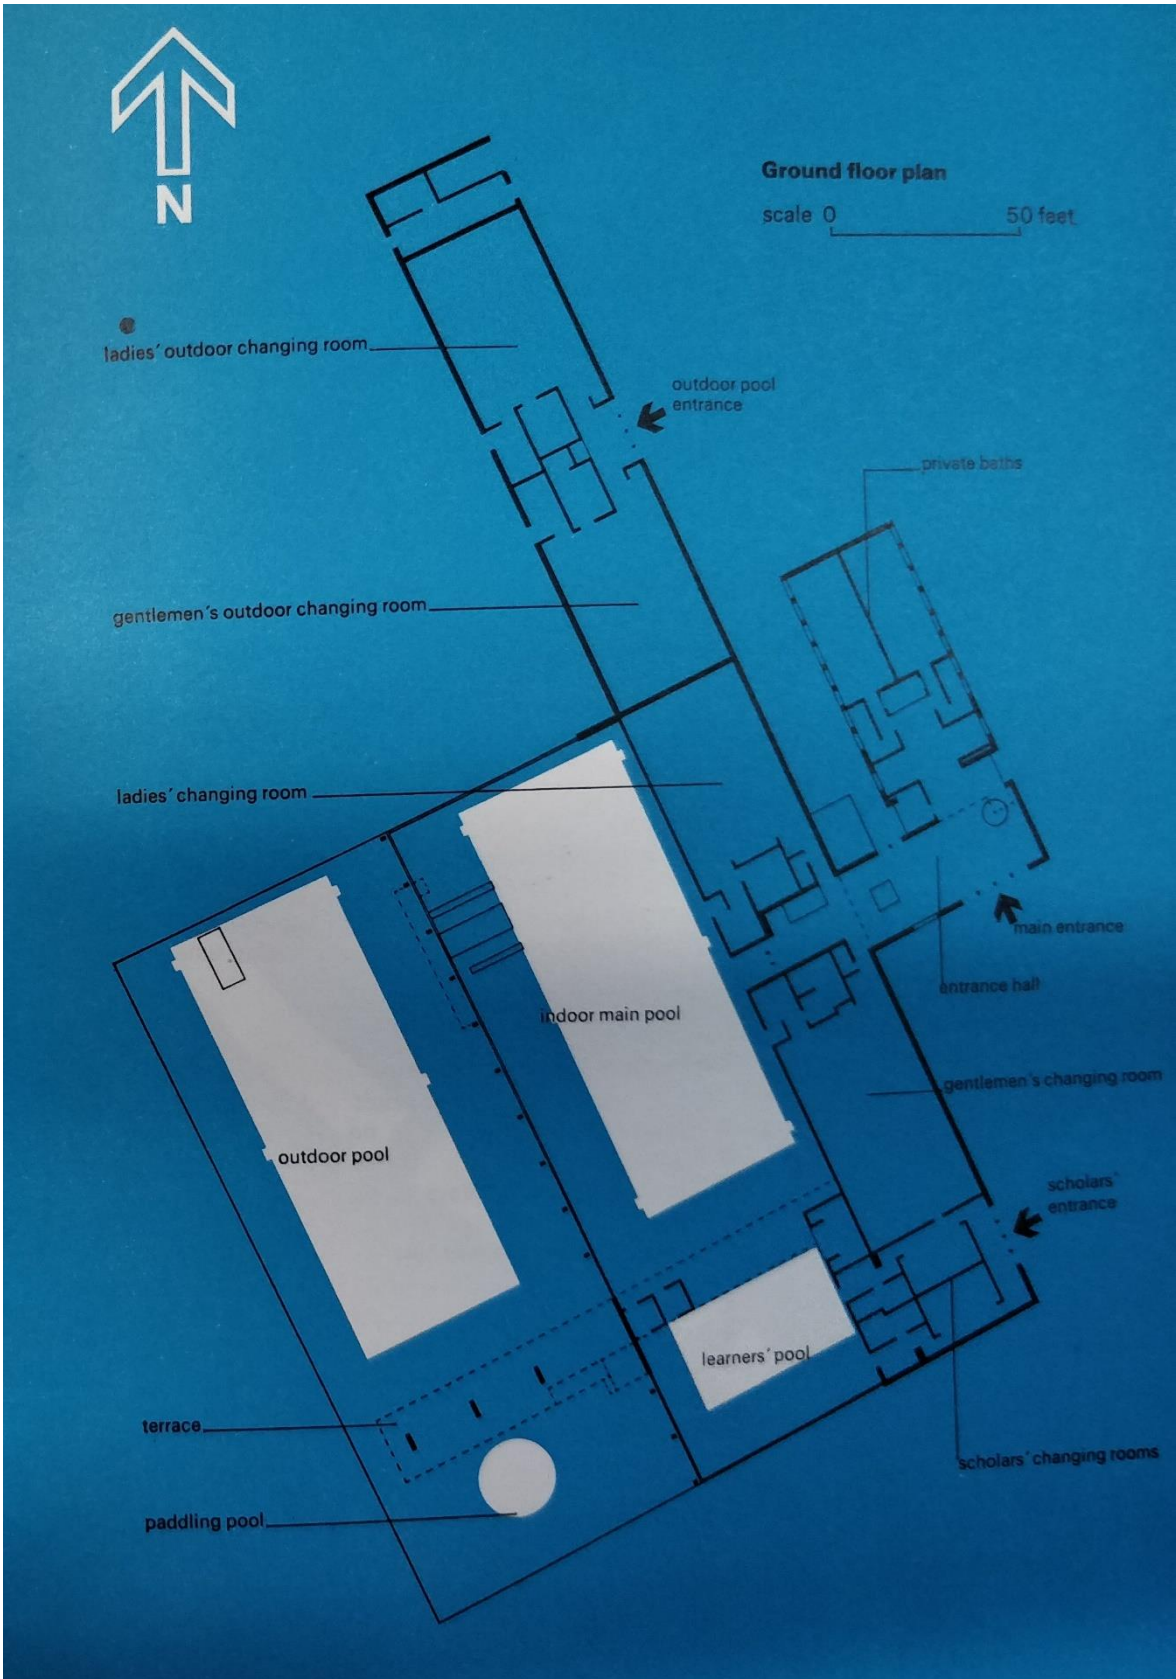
The Ground Floor Plan of the Richmond Public Baths (Source: London Borough of Richmond Upon Thames 1966)
